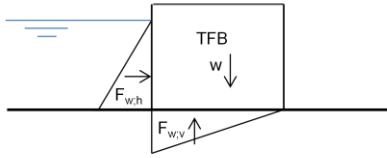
Typical loads on a schematized temporary water-retaining structure consisting of layers of sand bags.
